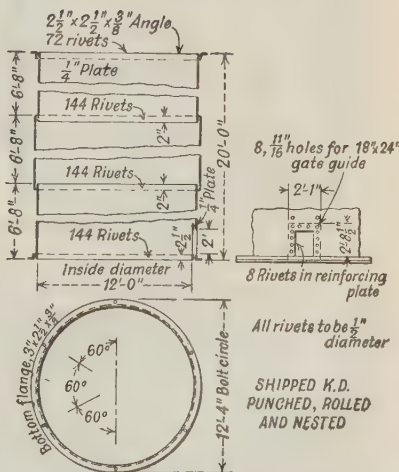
100-ton flat-bottom cylindrical steel bin (99 J 195).
